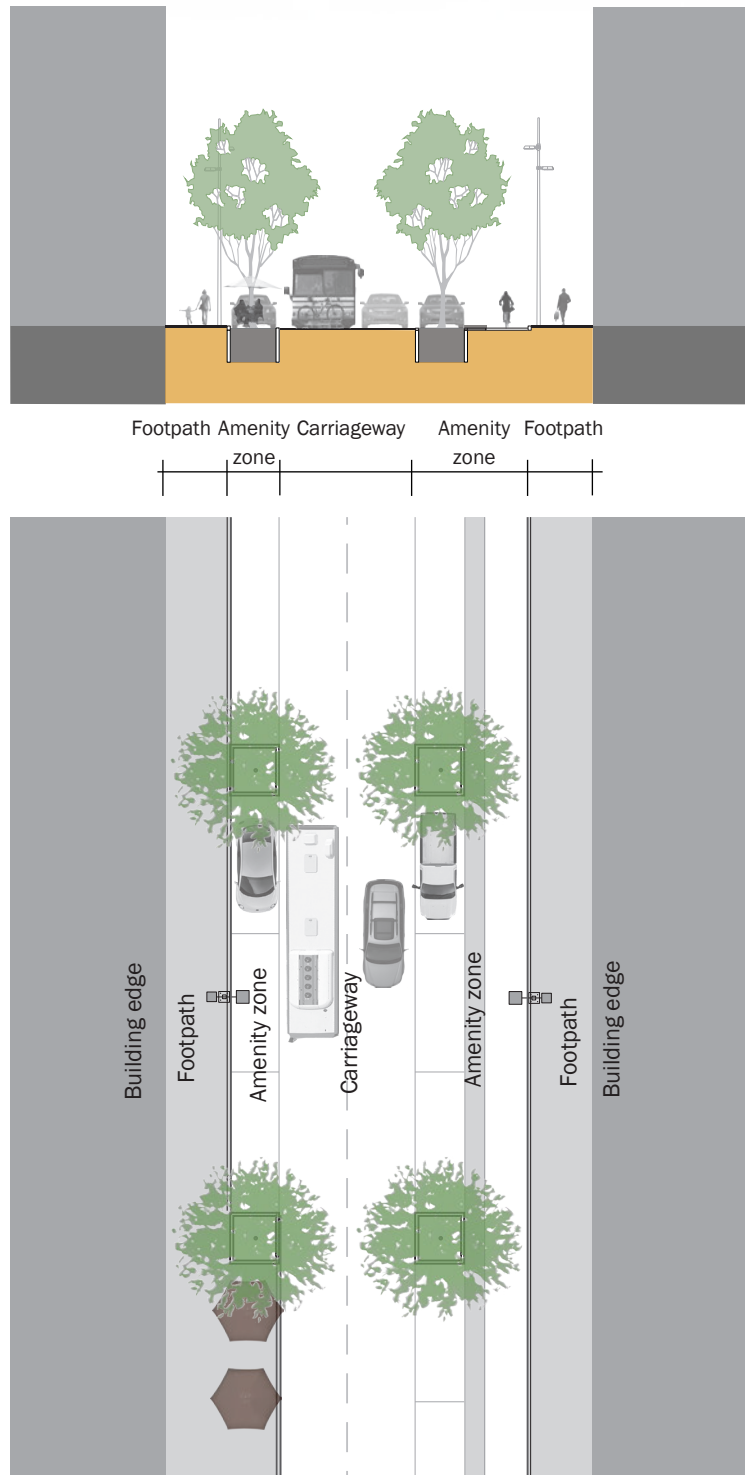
Example of a concept section showing streetscape zones (not to scale)
